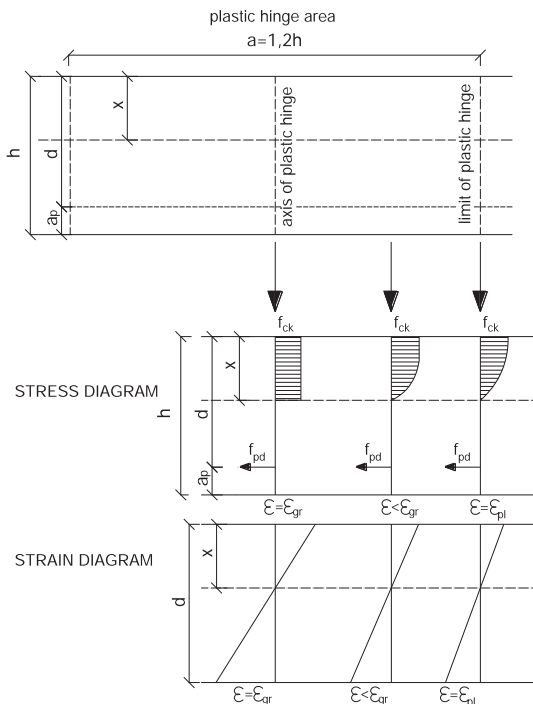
Concept of a plastic hinge in a reinforced concrete beam
